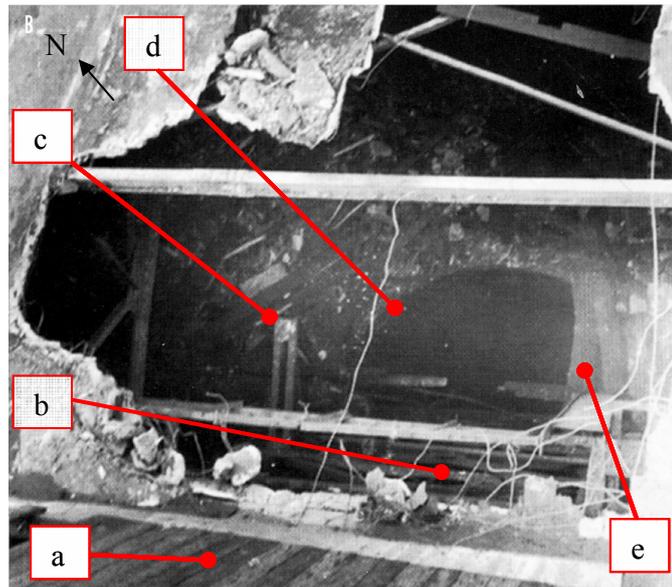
Looking down the shattered concrete roof of #2 Shaft House into the completely destroyed ventilation compartment. Legend: a) wooden cladding of the hoist frame; b) hoist frame lattice steel structure; c) ground level with debris; d) large deck plate, bent vertically upwards; e) intact deck plate; (photo from Hohmann and Mehnert 2004).
